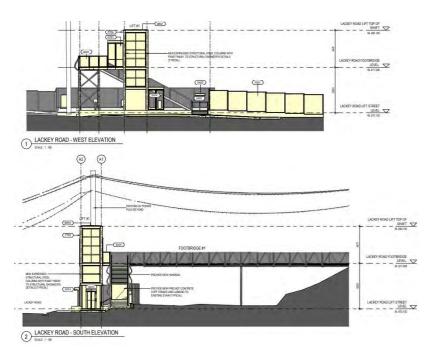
Lackey Road west and south elevation (Architectus, drawings dated 19/1/2024)
